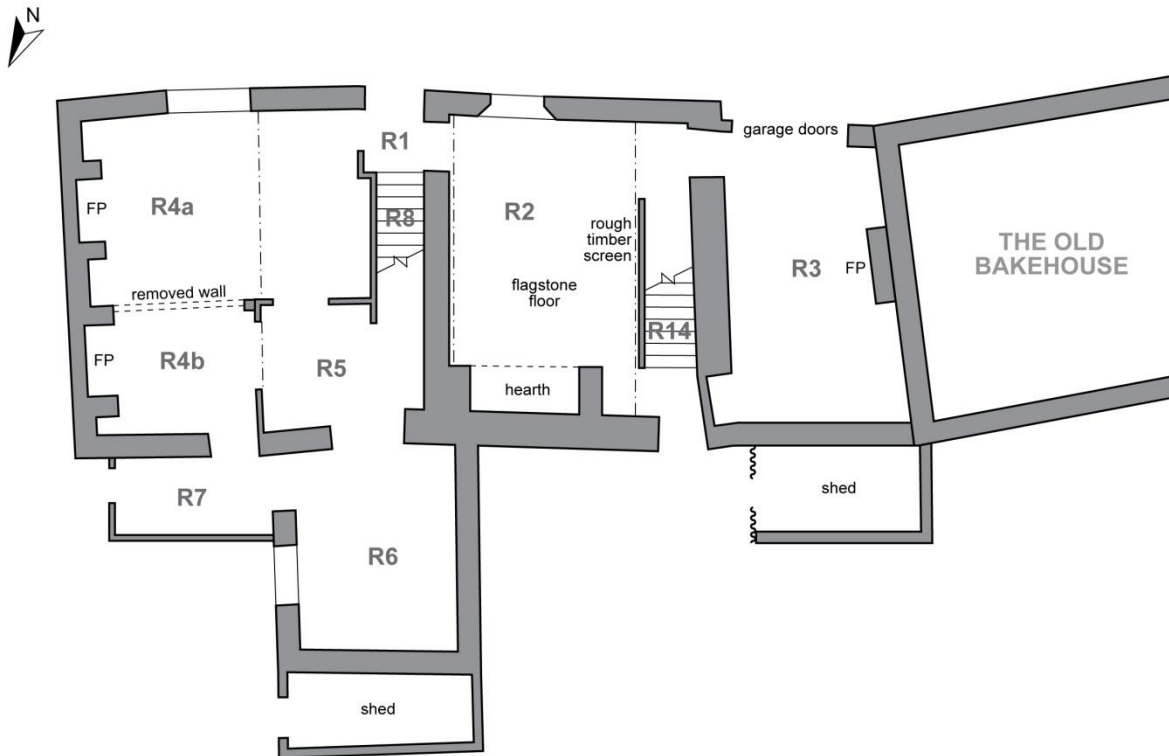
GROUND-FLOOR PLAN OF THE COTTAGE.
